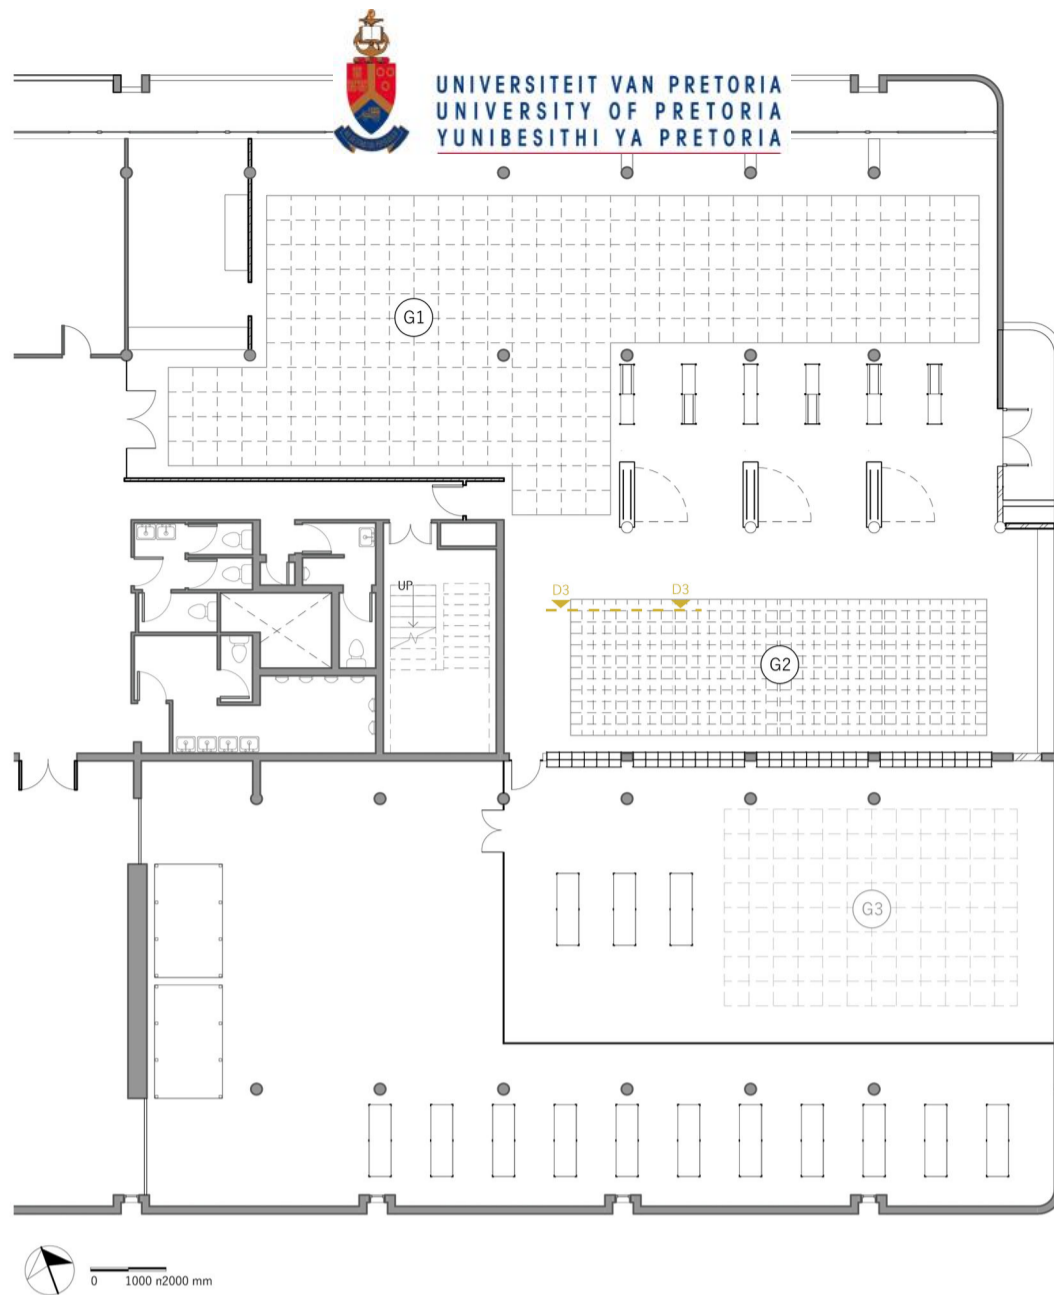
Kinetic armature layout (Author. 2016)
